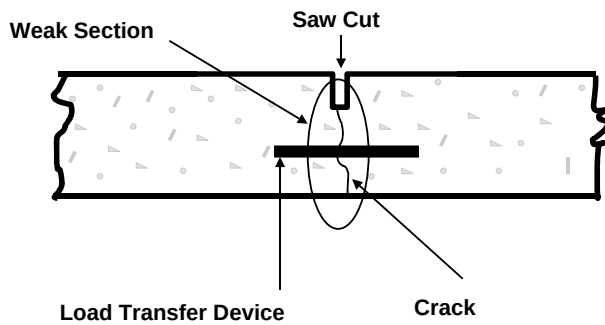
The concept of transverse contraction joints in jointed plain concrete pavements
